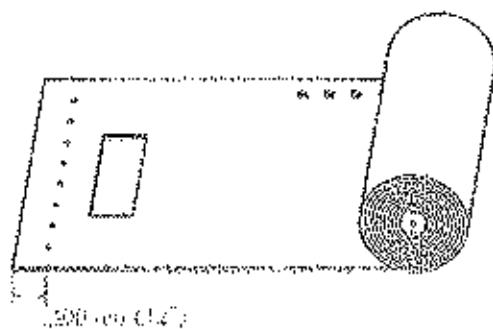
Location Of Lifting Tool - 3 Holes In The End Of Rubber Body
